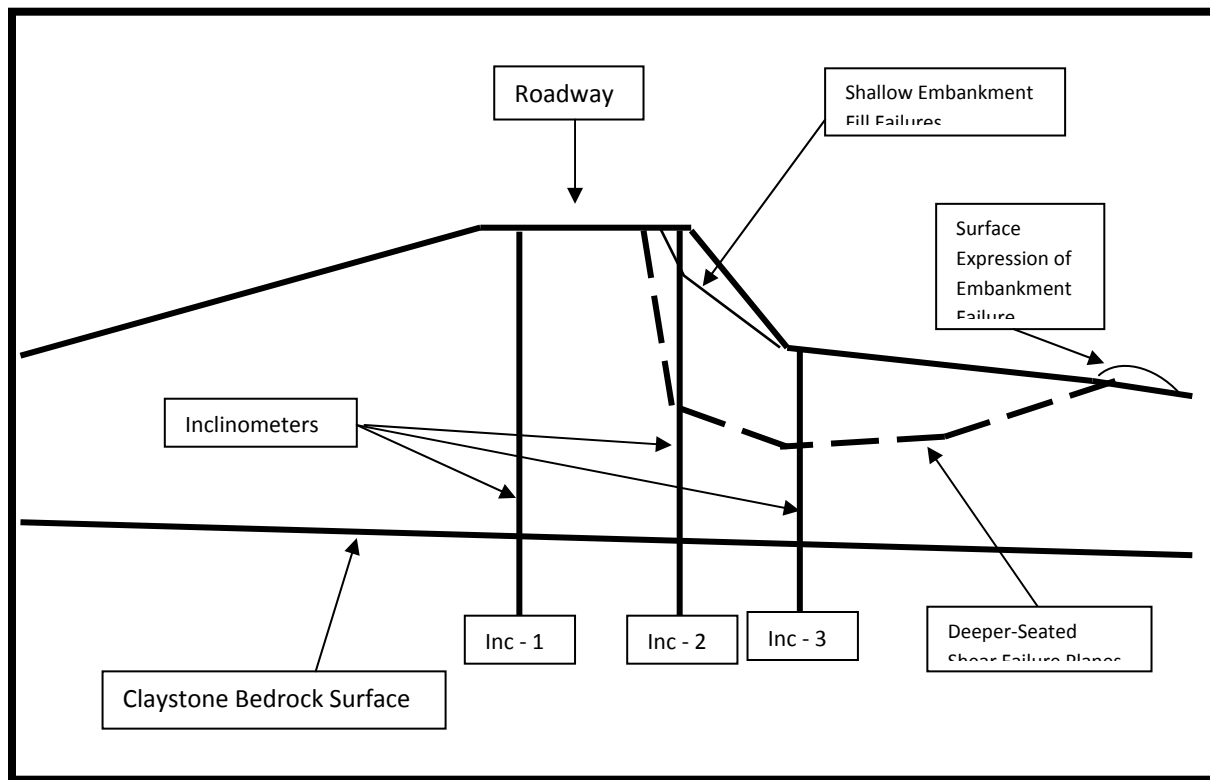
Generalized Cross Section Looking South Through The Embankment Fill Failure.
